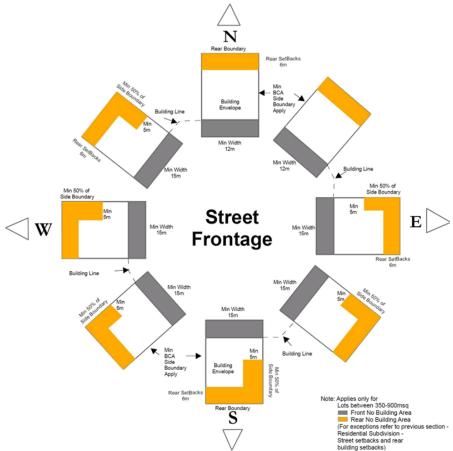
Solar Access Orientation - Minimum Building Envelopes and Lot Widths
